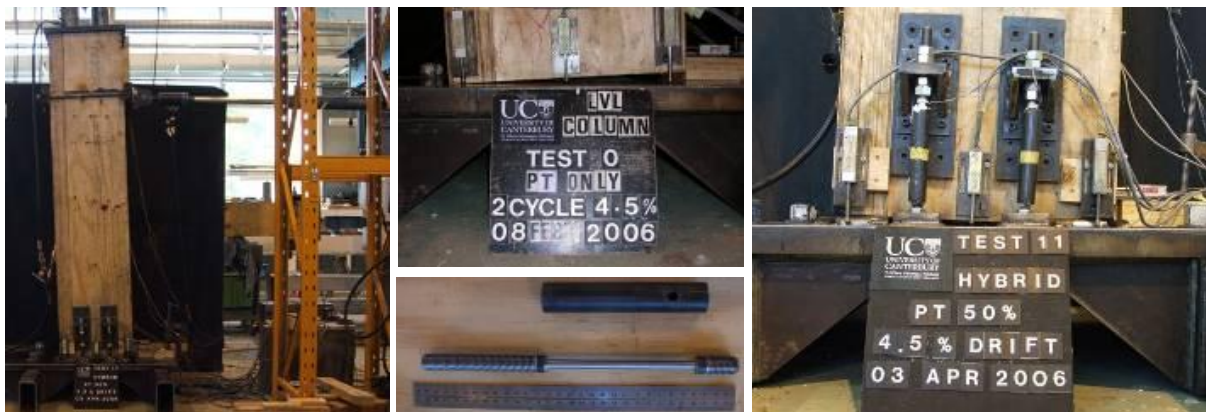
Testing of an hybrid post-tensioned column-to-foundation connections with replaceable dissipaters (observed performance at 4.5% drift) (Palermo et al., 2006).
